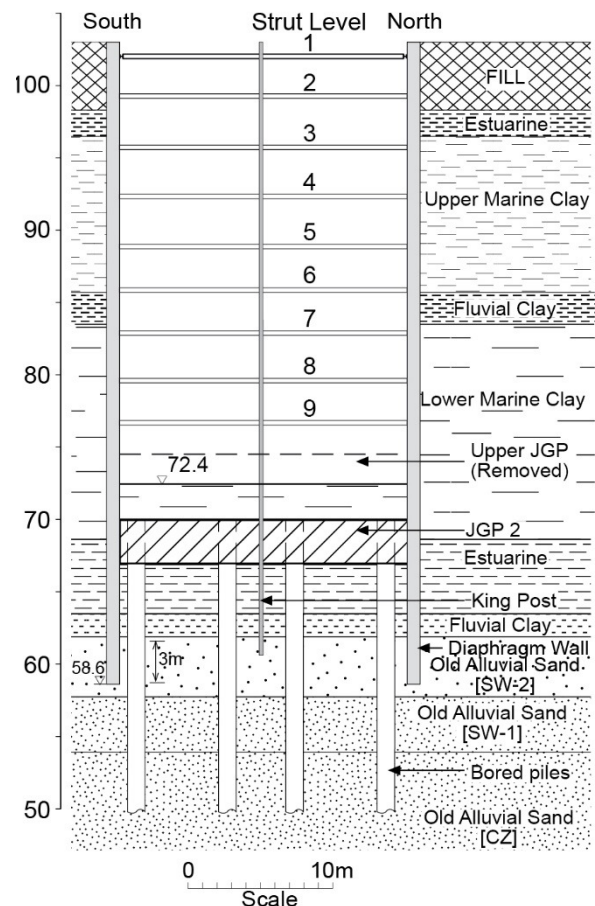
Design cross-section of the Nicoll Highway excavation.
